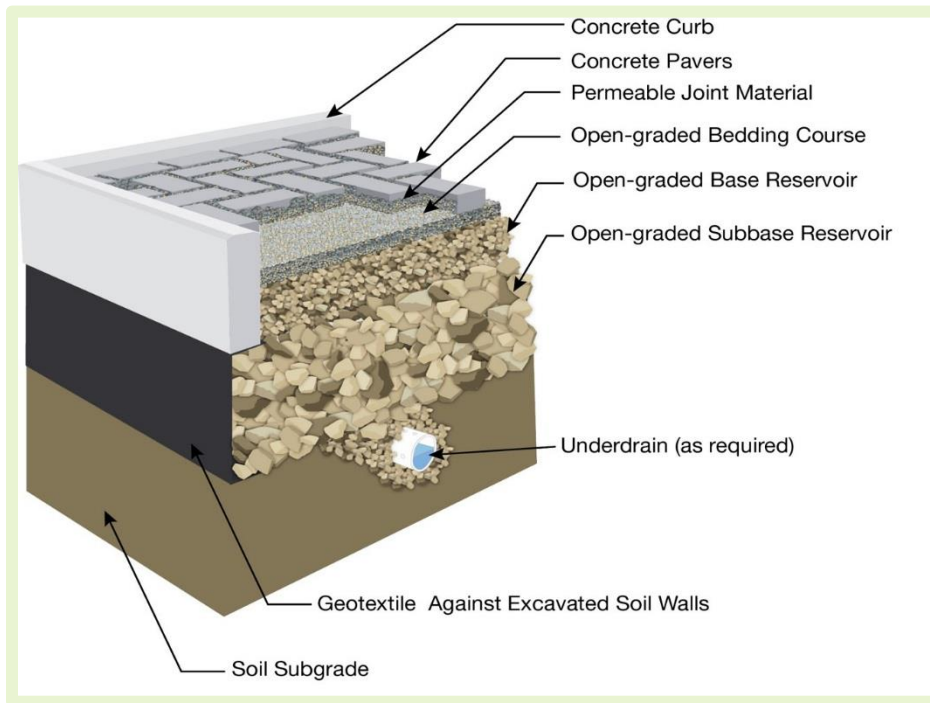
Permeable pavers designed for partial infiltration, with underdrain (Credit: Interlocking Concrete Pavement Institute)
